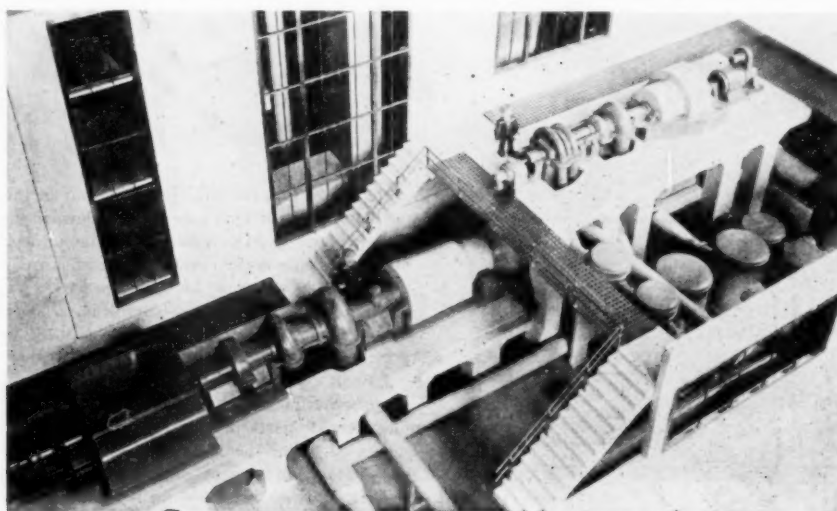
IDEAL ARRANGEMENT OF MACHINE SET SHOWING FLOORS PARTIALLY REMOVED
